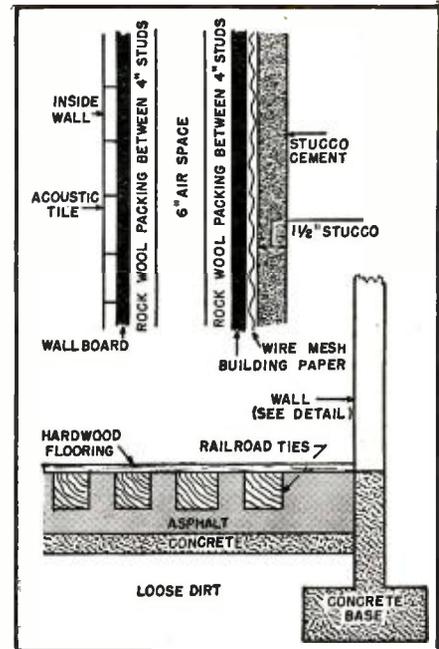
Cross section of the construction used for the walls and floor of the Republic Production, Inc.'s scoring stage.
